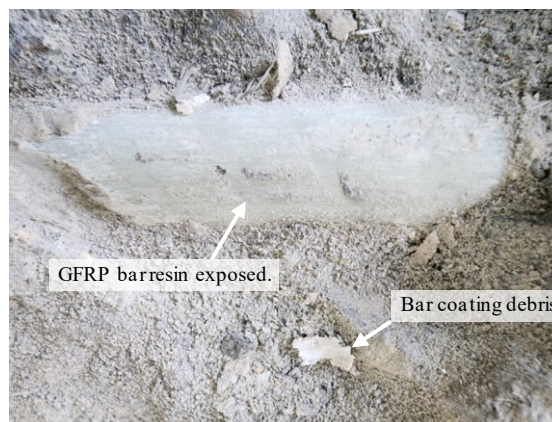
Typical final state of CB beam series. Pullout failure due to bar coating peeling off from bar resin. Bar coat debris are shown.
